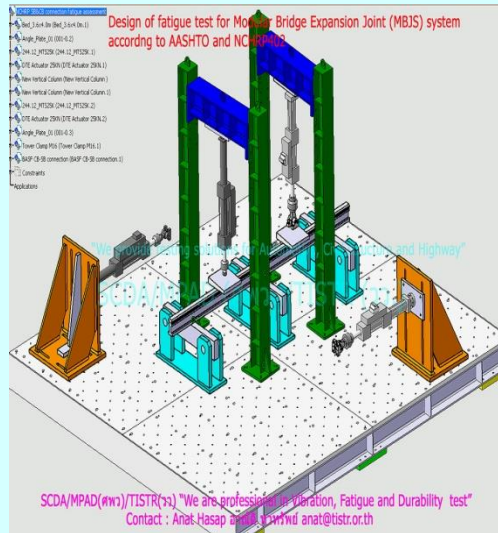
Fatigue Testing of Edge Beam of Expansion Joint
